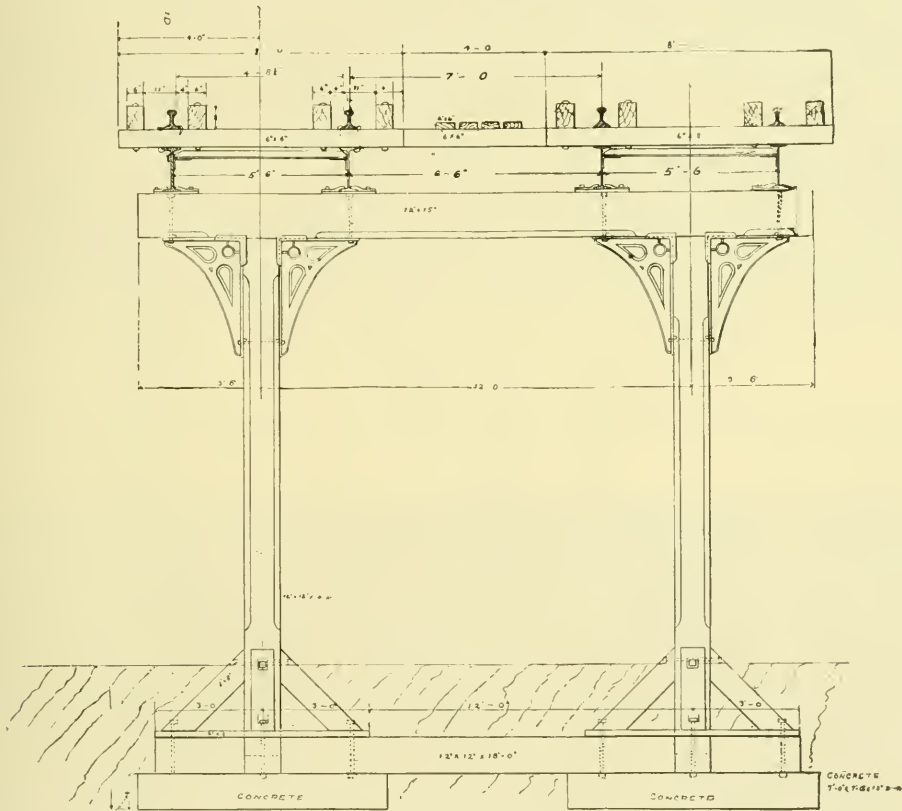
CROSS SECTION CONSTRUCTION OF ELECTRIC ELEVATED RAILWAY FOR WORLD'S FAIR GROUNDS
